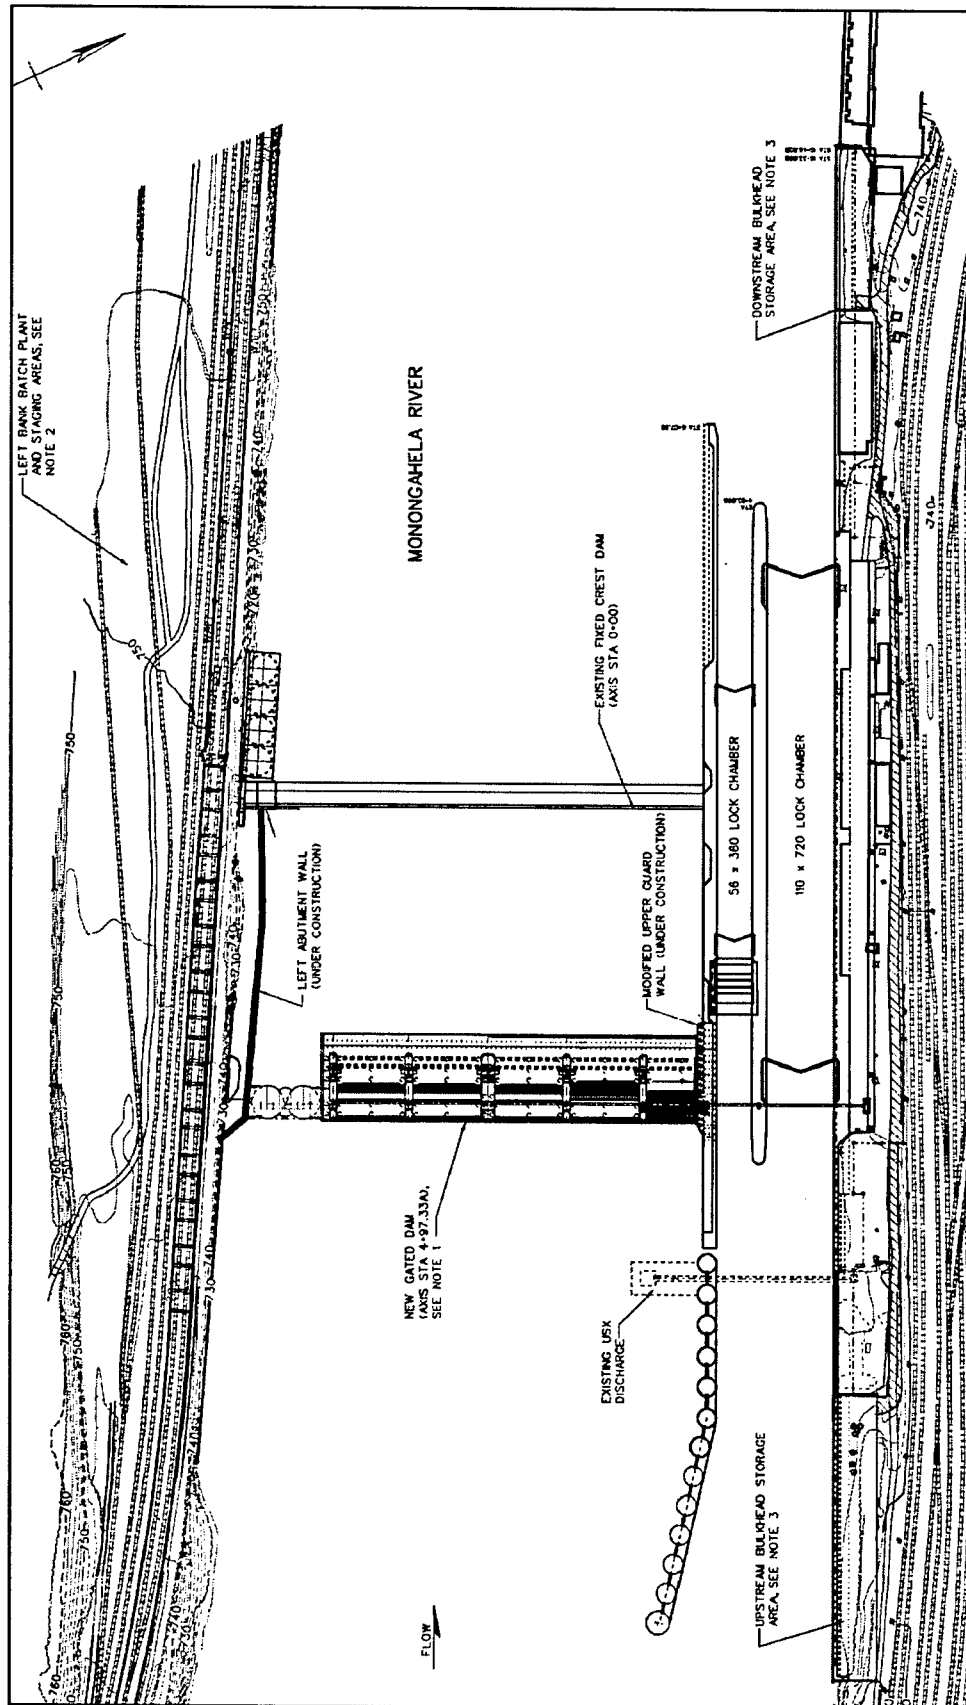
Location of new dam to be constructed upstream from existing Lock and Dam 2
